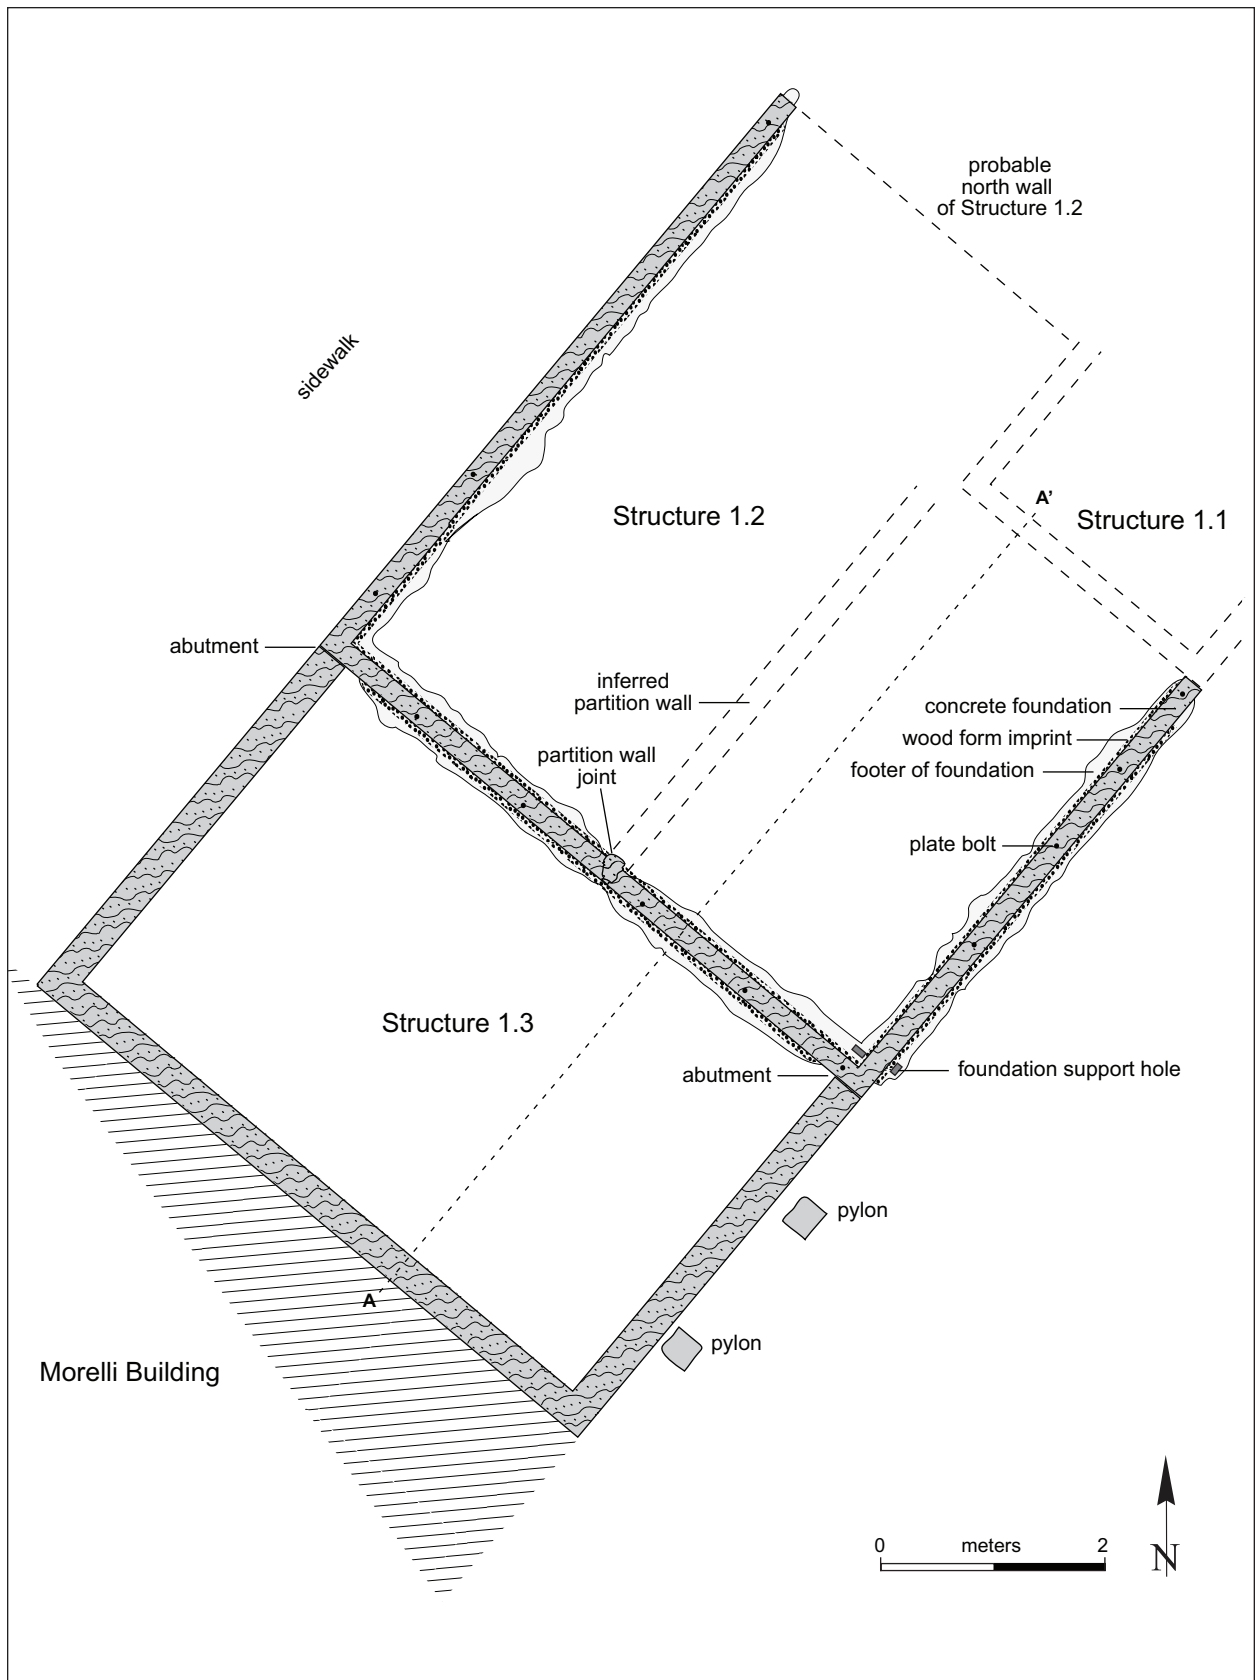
LA 146405, Structures 1.2 and 1.3, plan map.
